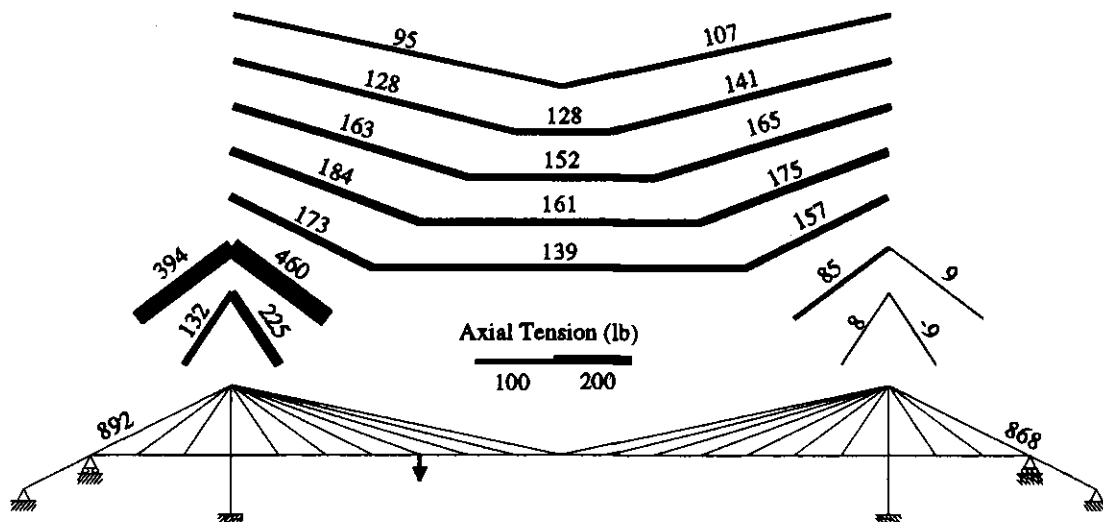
Live Load Forces and Deflections in Truss of Bluff Dale Bridge
